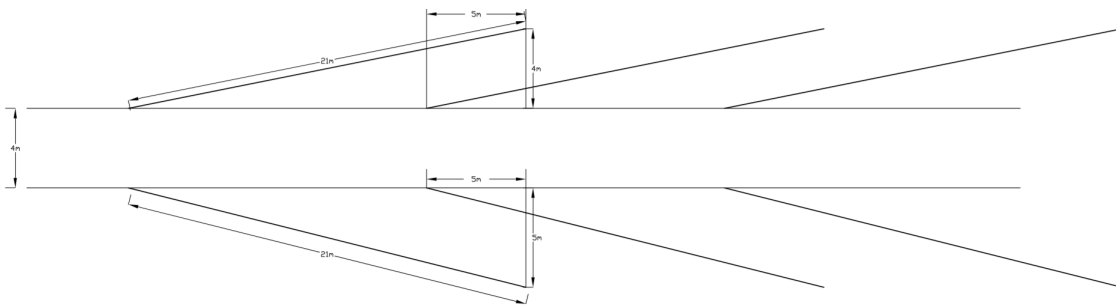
Profile for the grouting design (Technical drawing 762G1410-1027).
